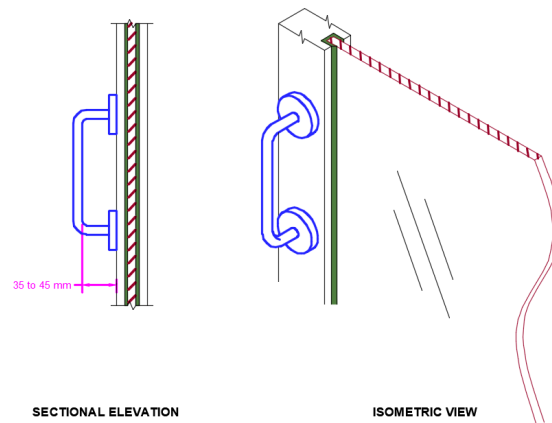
(B) EXAMPLE OF ACCEPTABLE DOOR HARDWARE FOR SLIDING DOORS
